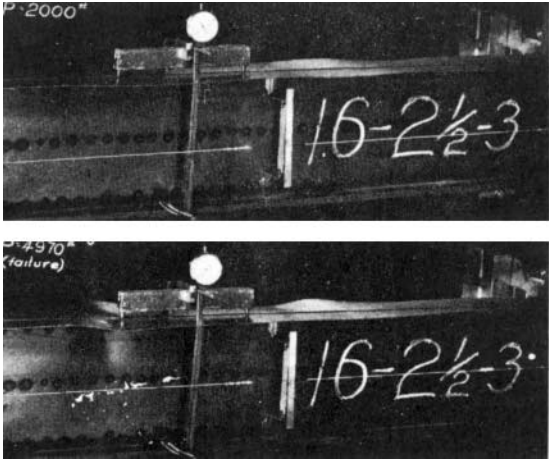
Consecutive load stages on I-beam.^{1,7}
